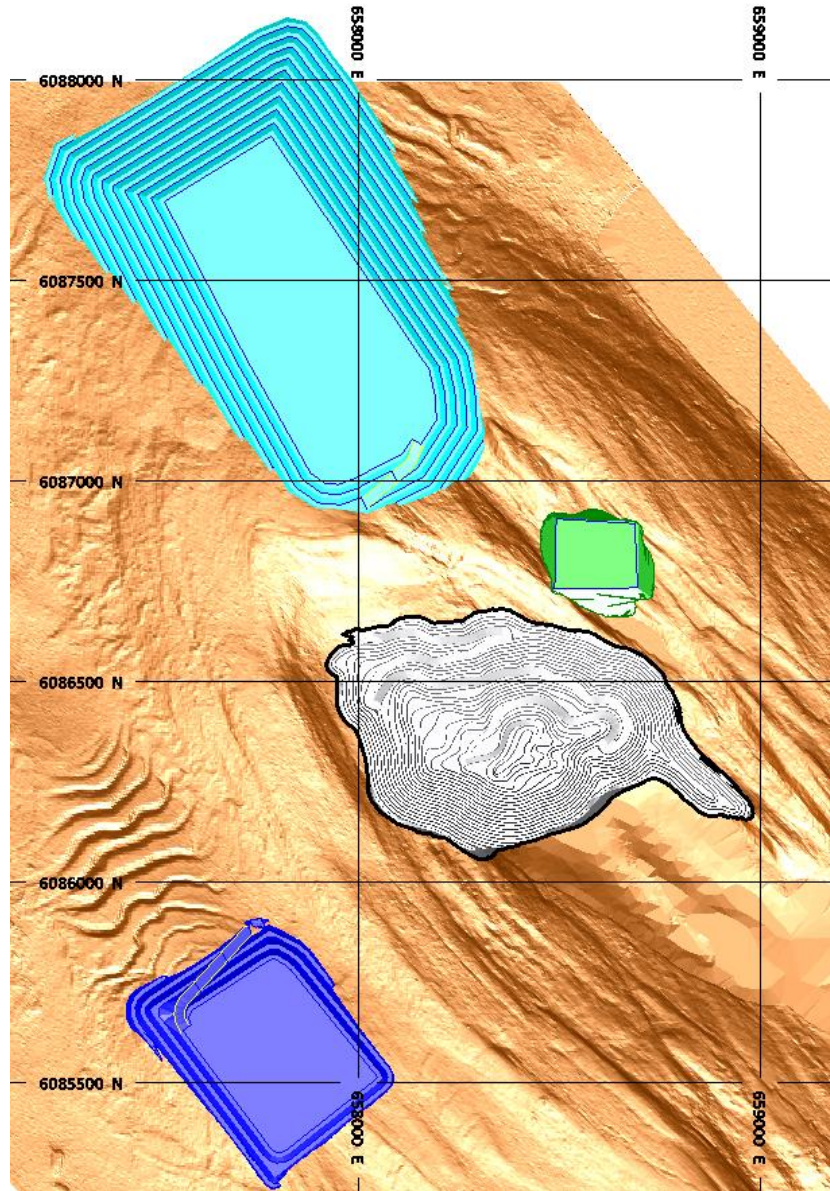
Waste Rock and Overburden Stockpile Area Plan
